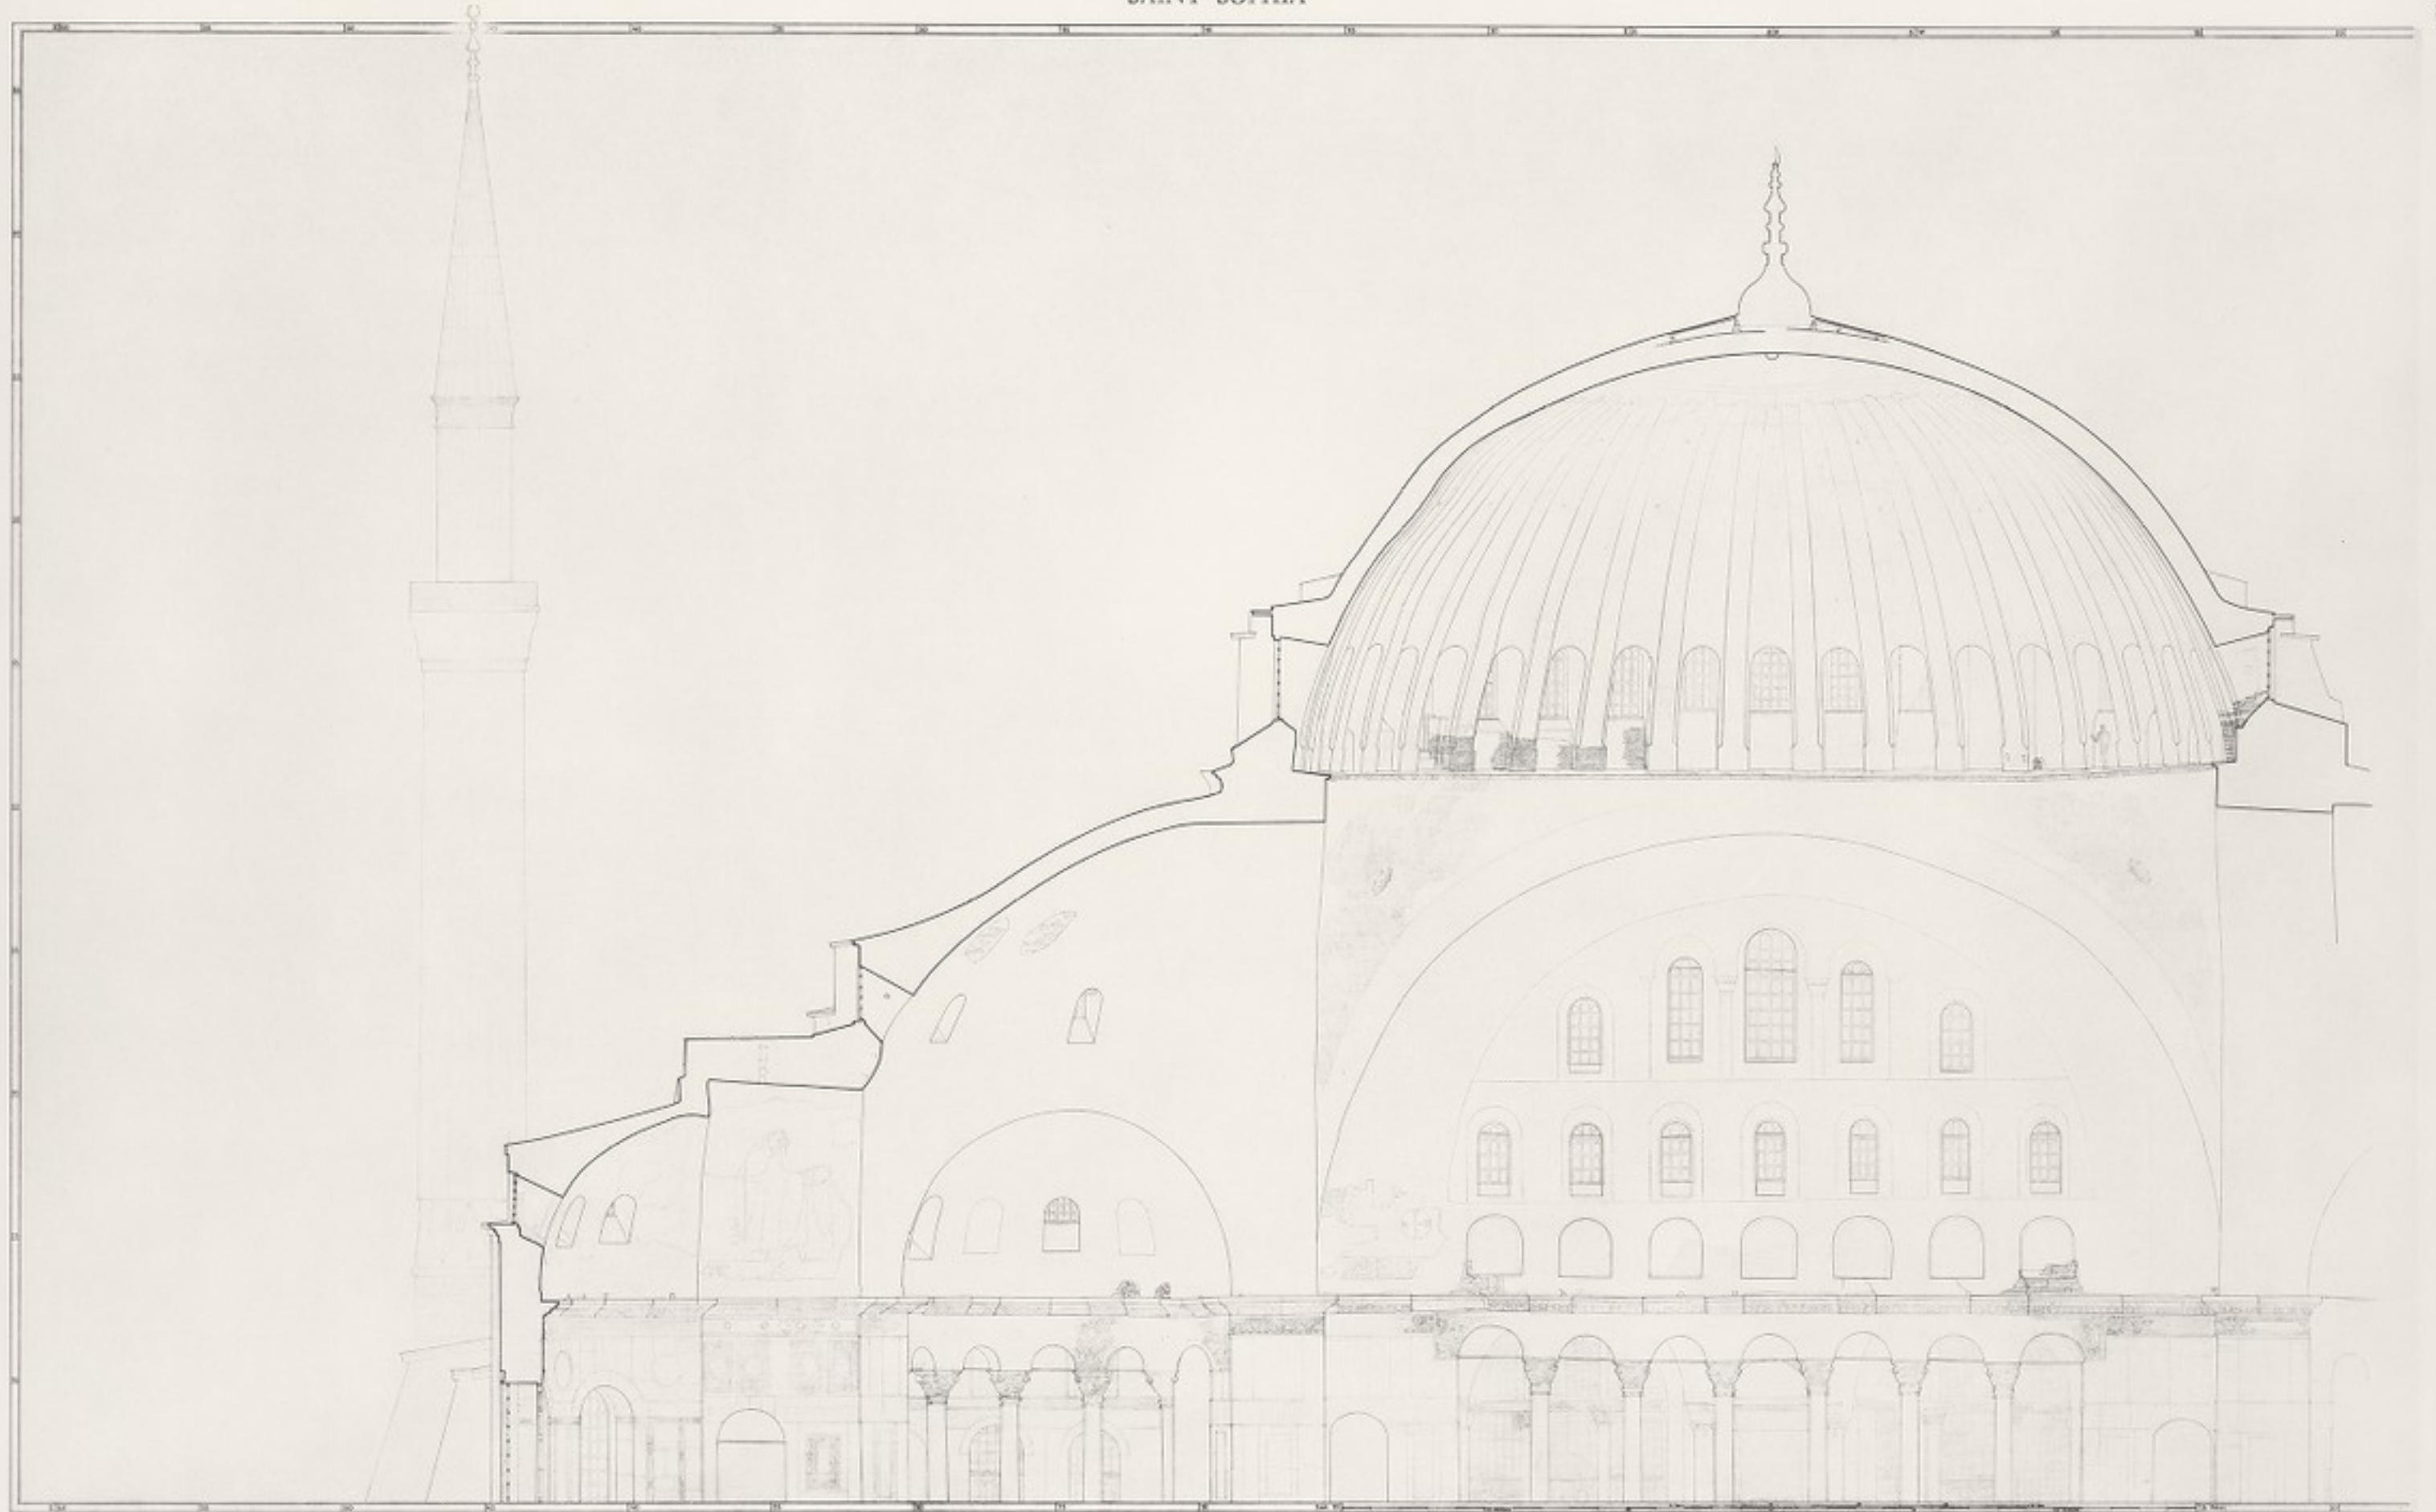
LONGITUDINAL SECTION, LOOKING SOUTH
